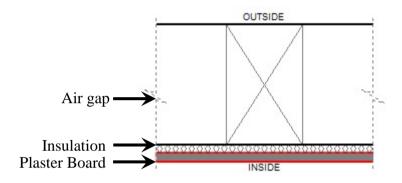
Arrangement of layers in insulated plaster ceiling
